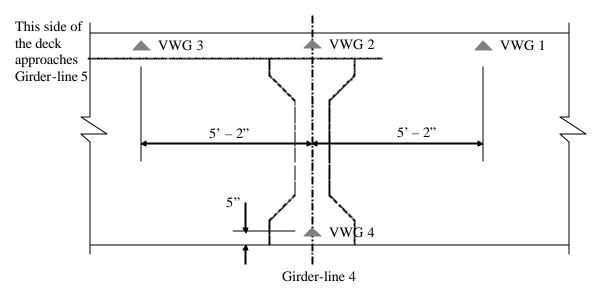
Installed Vibrating Wire Gauges In Cross-Sectional Locations In The Deck And Girder Of Bent Diaphragms
